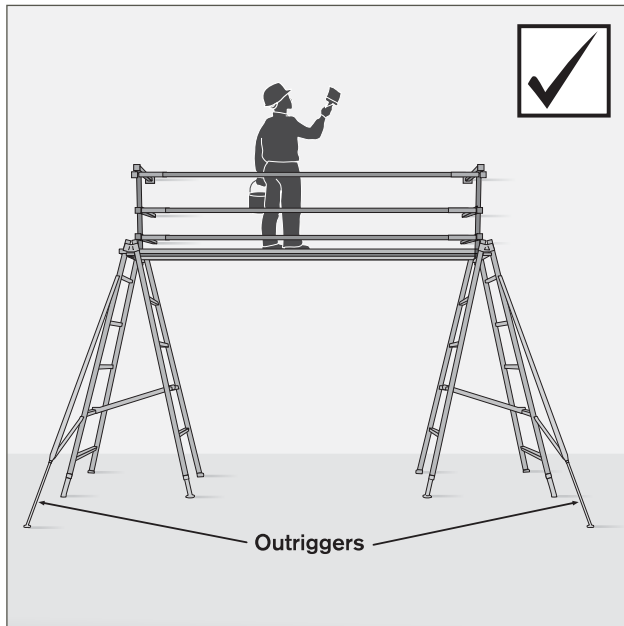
A correctly set up trestle ladder scaffold showing guardrailing and outriggers (toeboard not shown).
